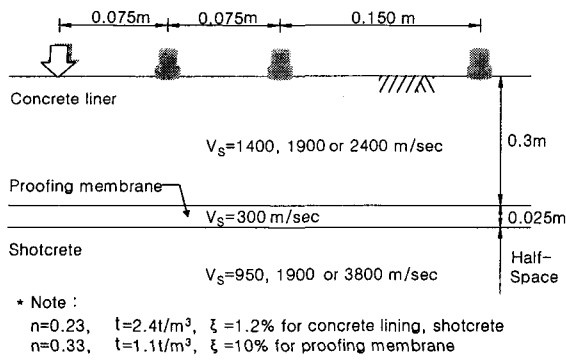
Numerical model of tunnel concrete lining for Fit7
